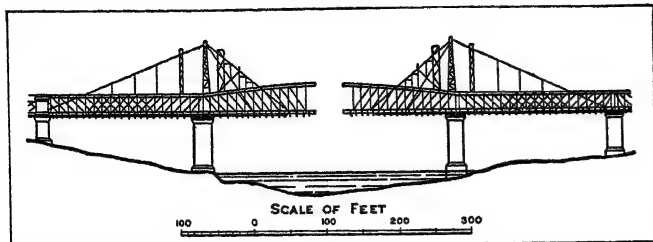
CANTILEVERING OUT, WEAR BRIDGE, SUNDERLAND, ENGLAND
